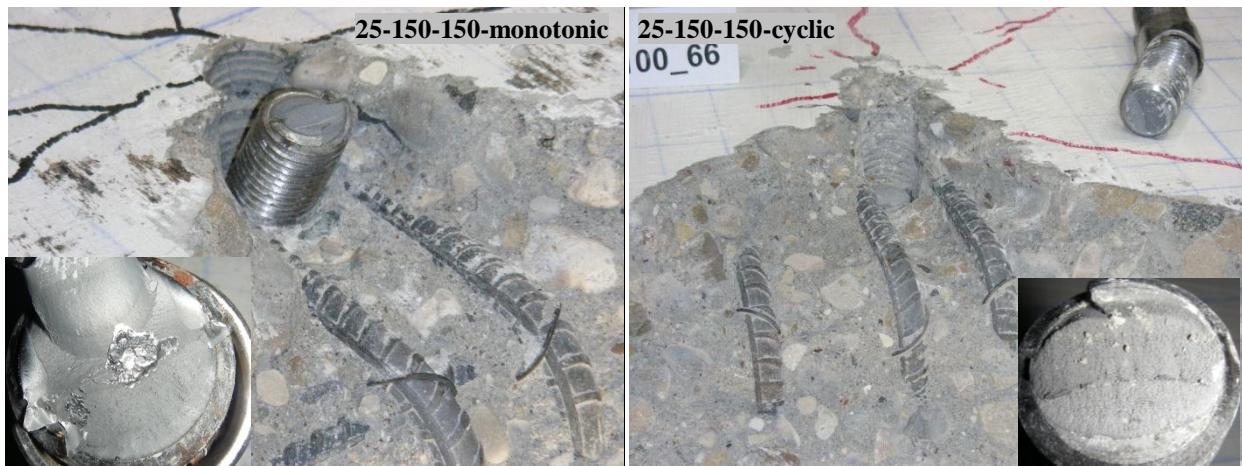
Typical fractured shape of 1-in. anchor bolts
